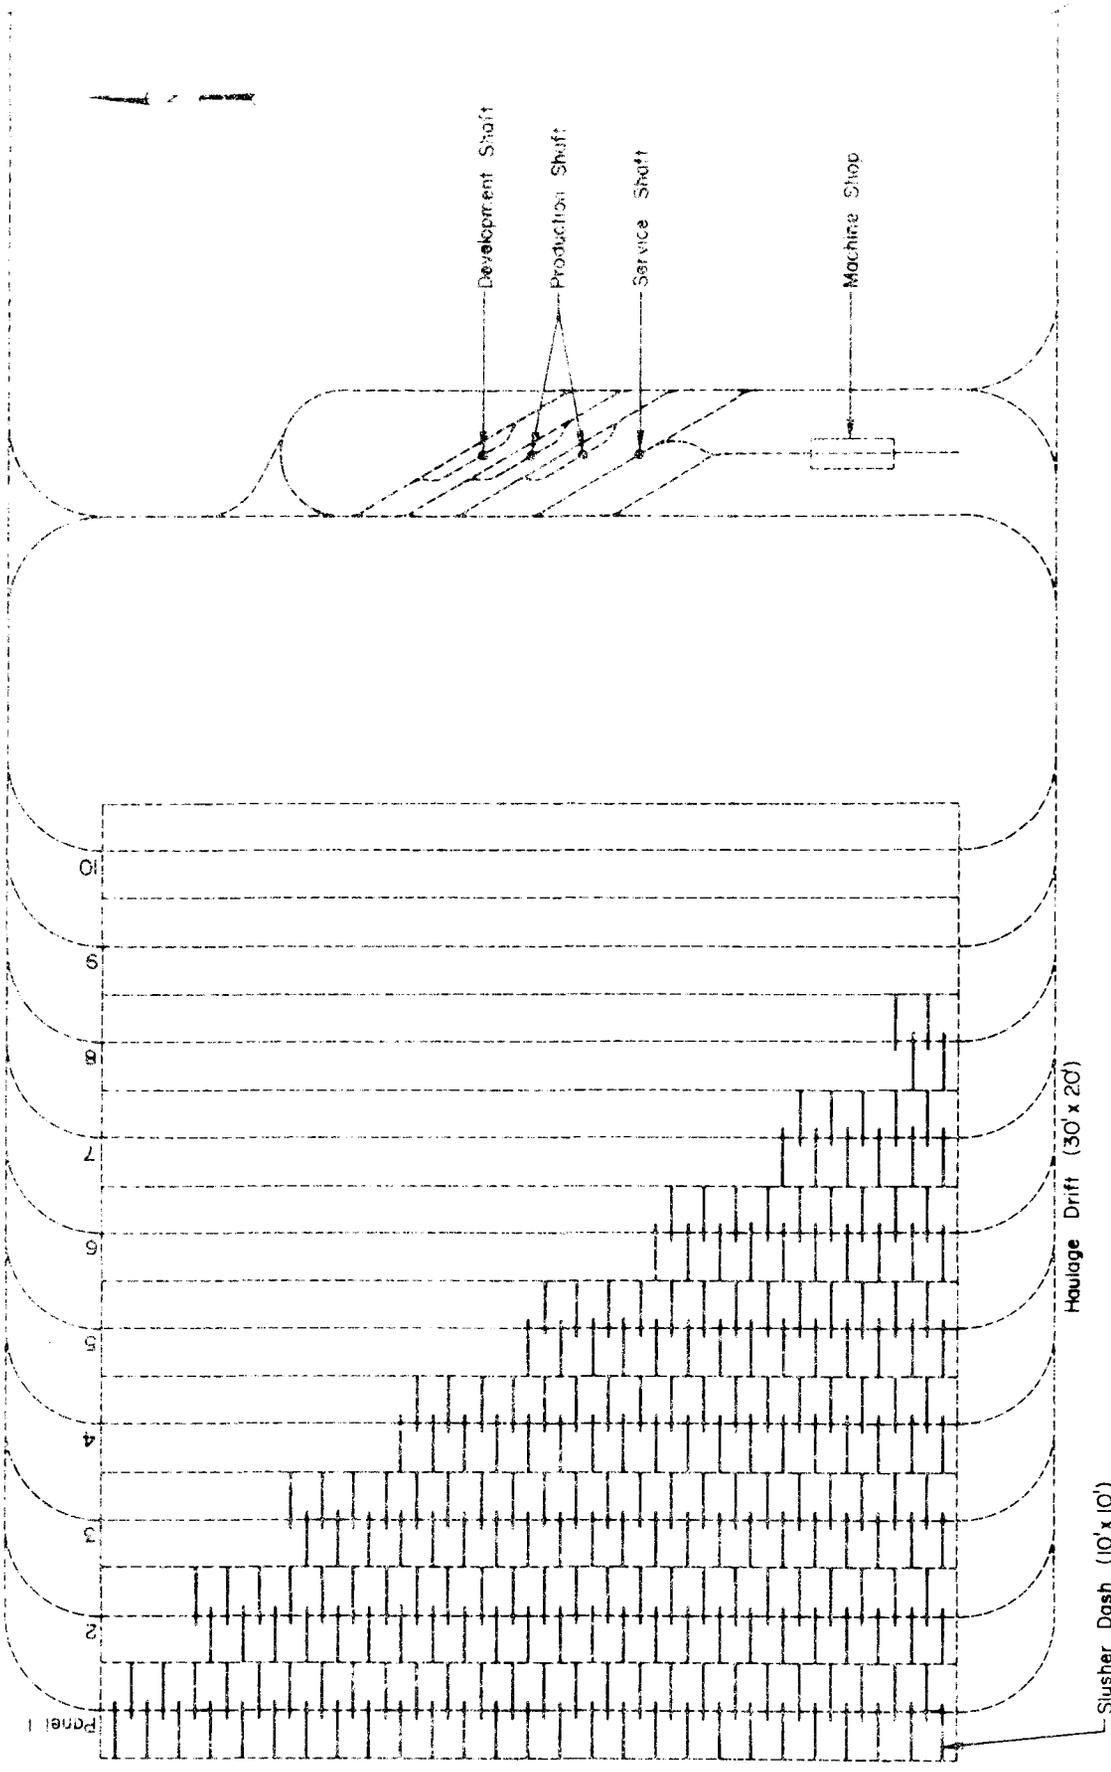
Plan View of Slusher Level, Block Caving with Slushers
